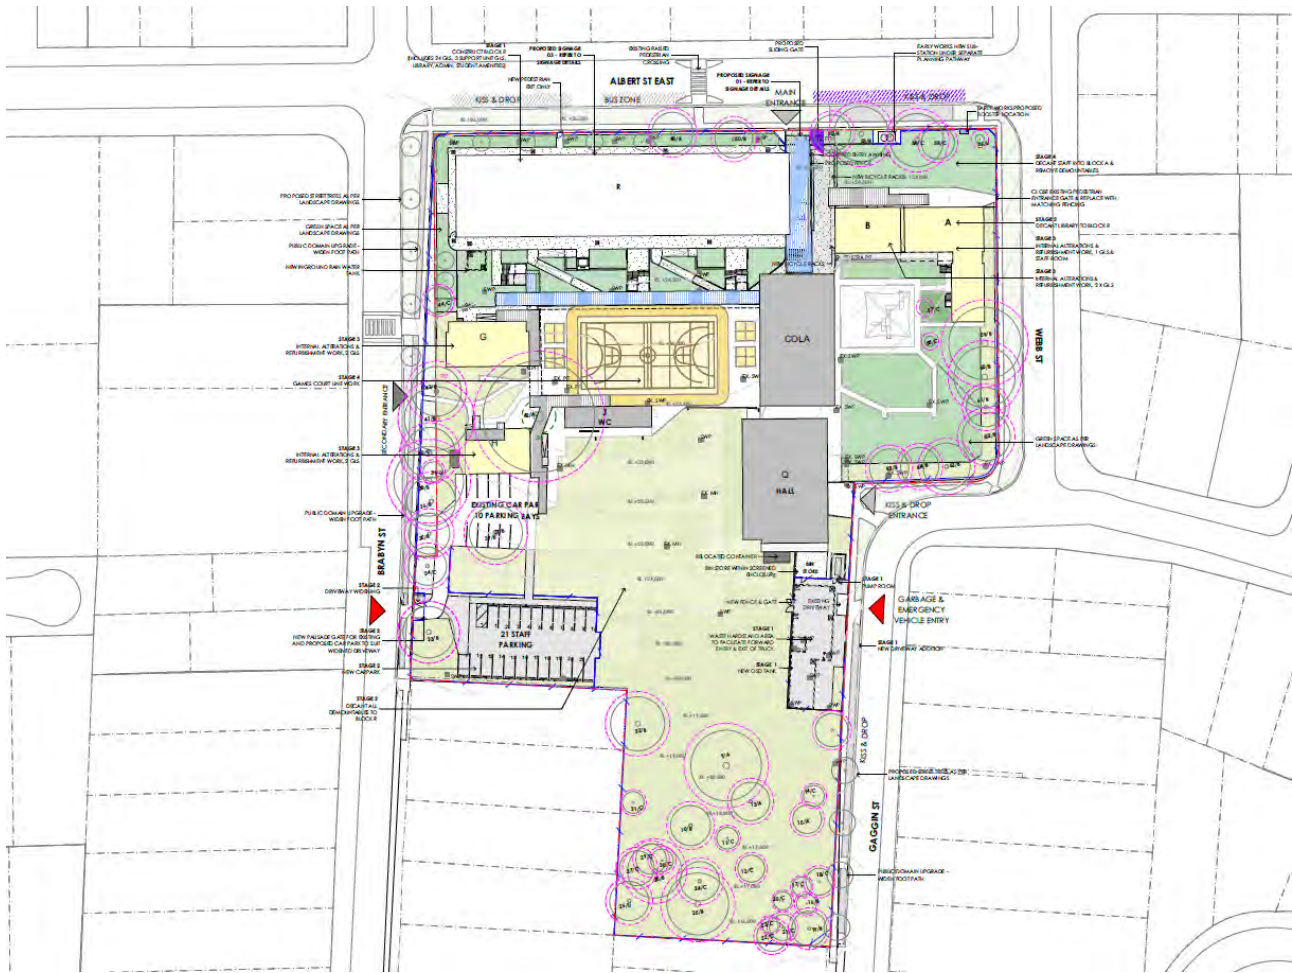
Excerpt from Site Plan Proposed. (PEPS-JDH-ZZ-XX-DR-A-0012, Revision B). JDH Architecture, 11 December 2024.
